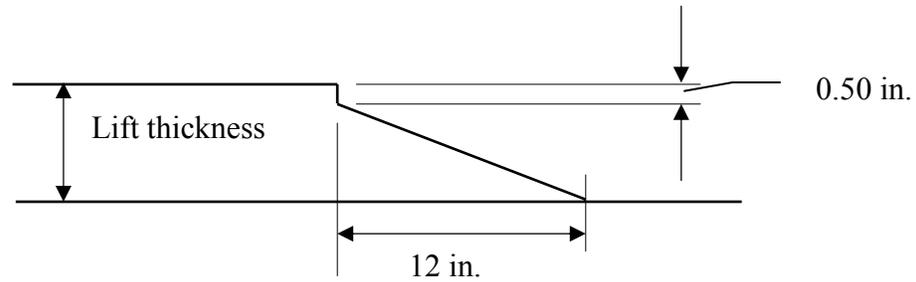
Notched Wedge Longitudinal Construction Joint
